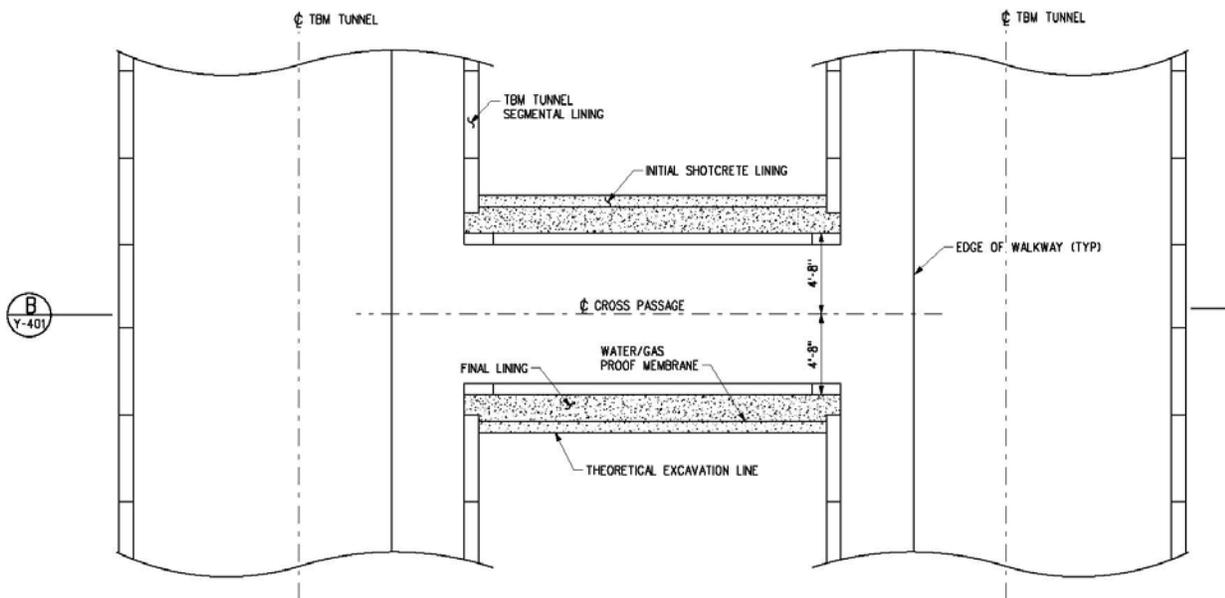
Typical Plan of Cross Passage for LRT Alternative
